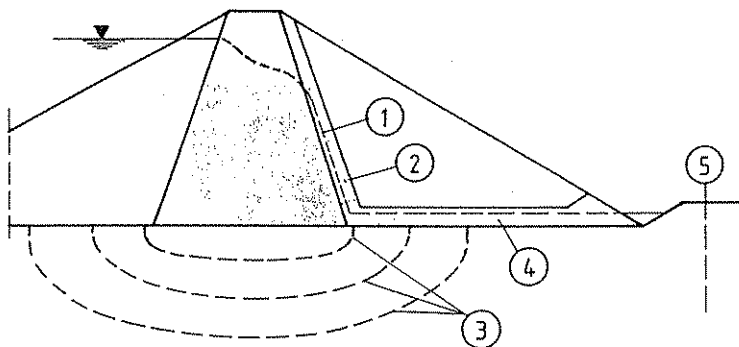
Rockfill dam with vertical earth core. Seepage through dam and foundation after impounding.
